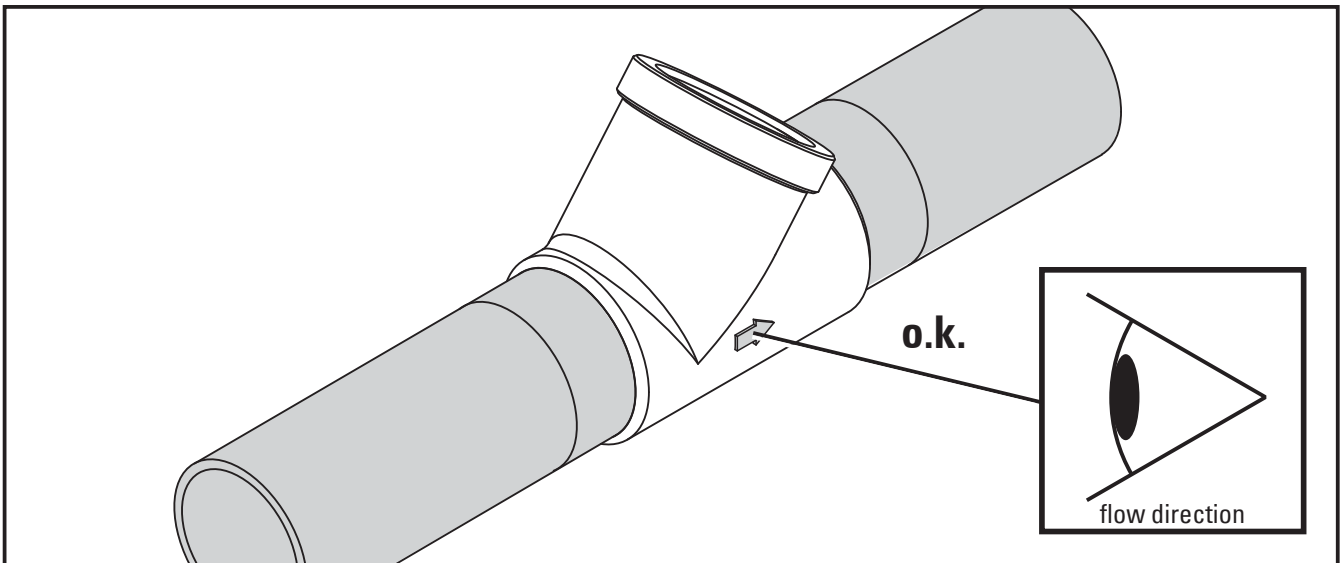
spill valves, welding of the body between two pipes (Fig.: body of Art. UV330164)
